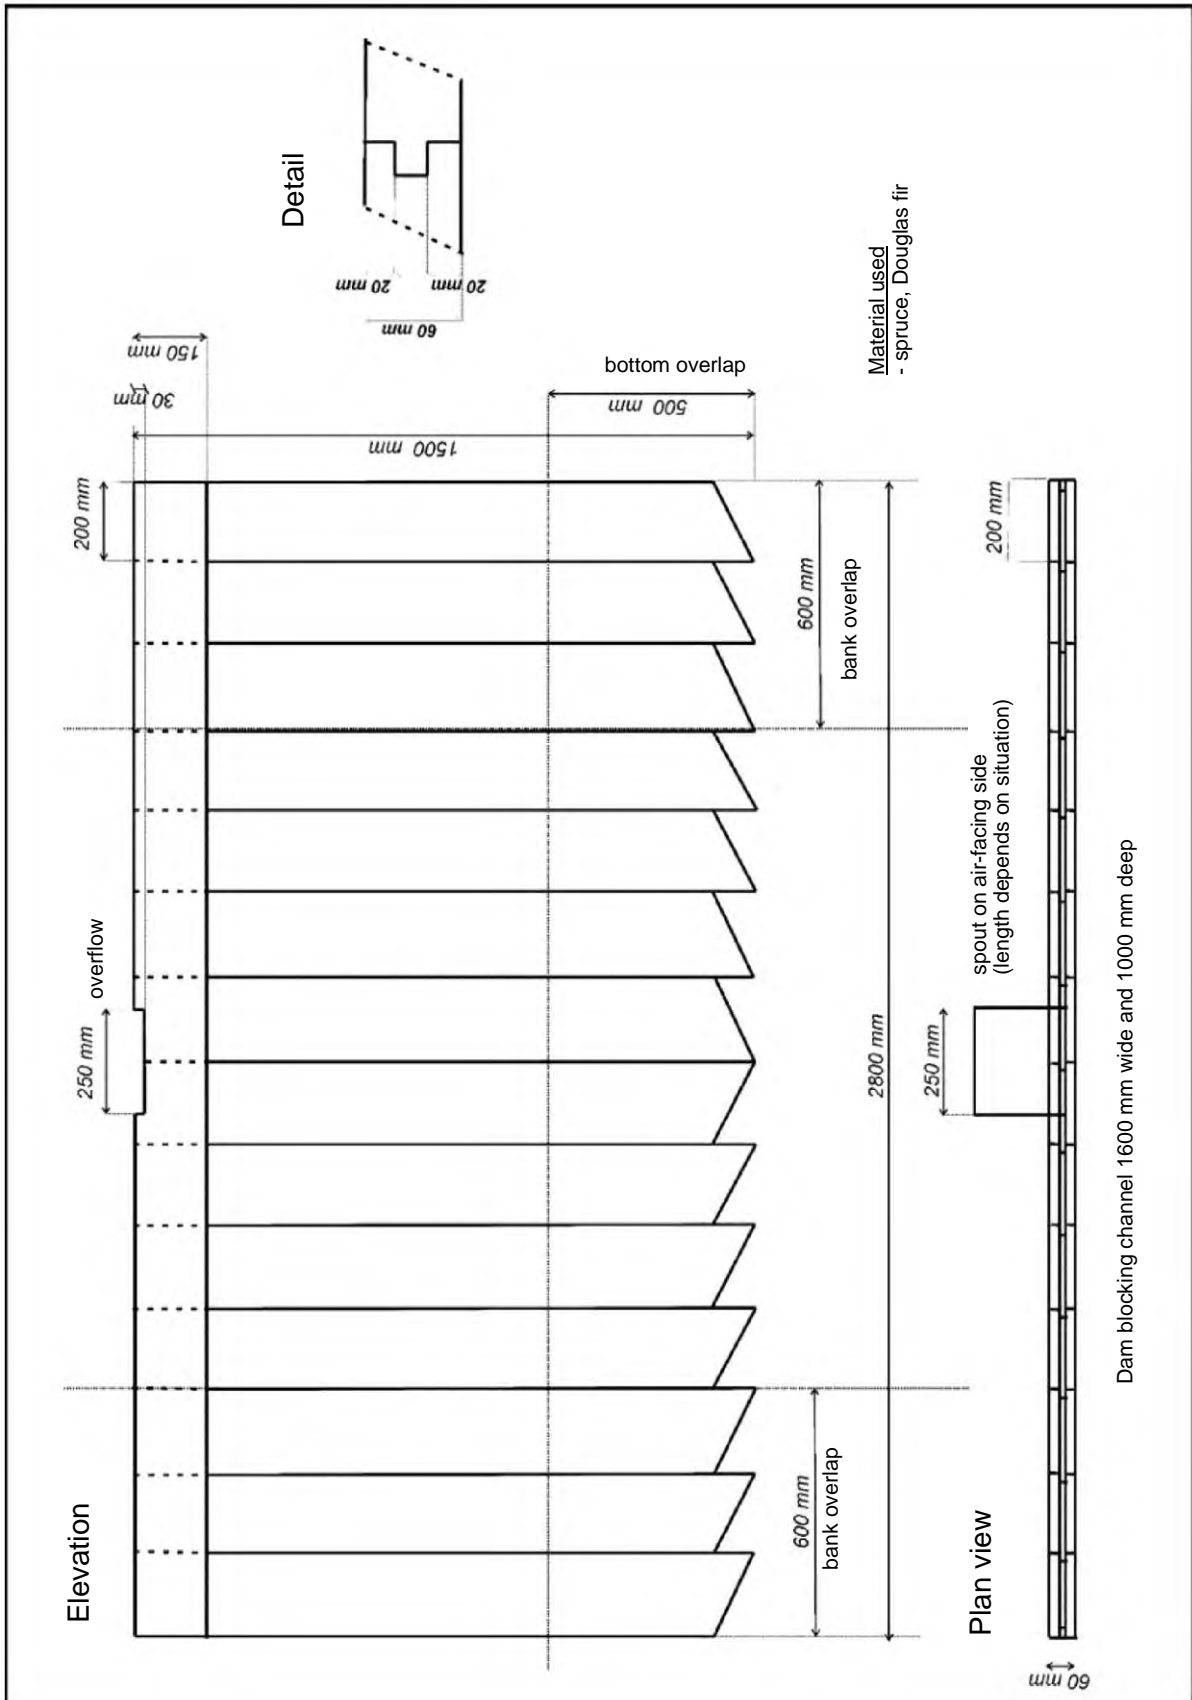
Schematic of vertically installed dam made of machined planks, tongue-and-groove joints.
